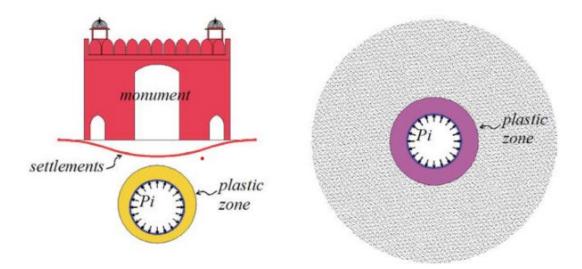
Settlement on Surface Structure due to Shallow Tunneling
